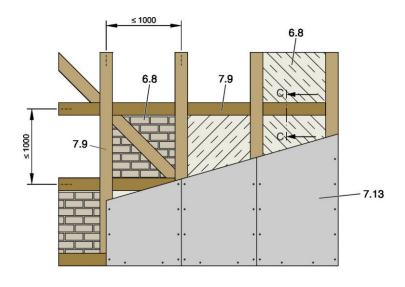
Lightweight partition wall with timber support structure and cladding on both sides
